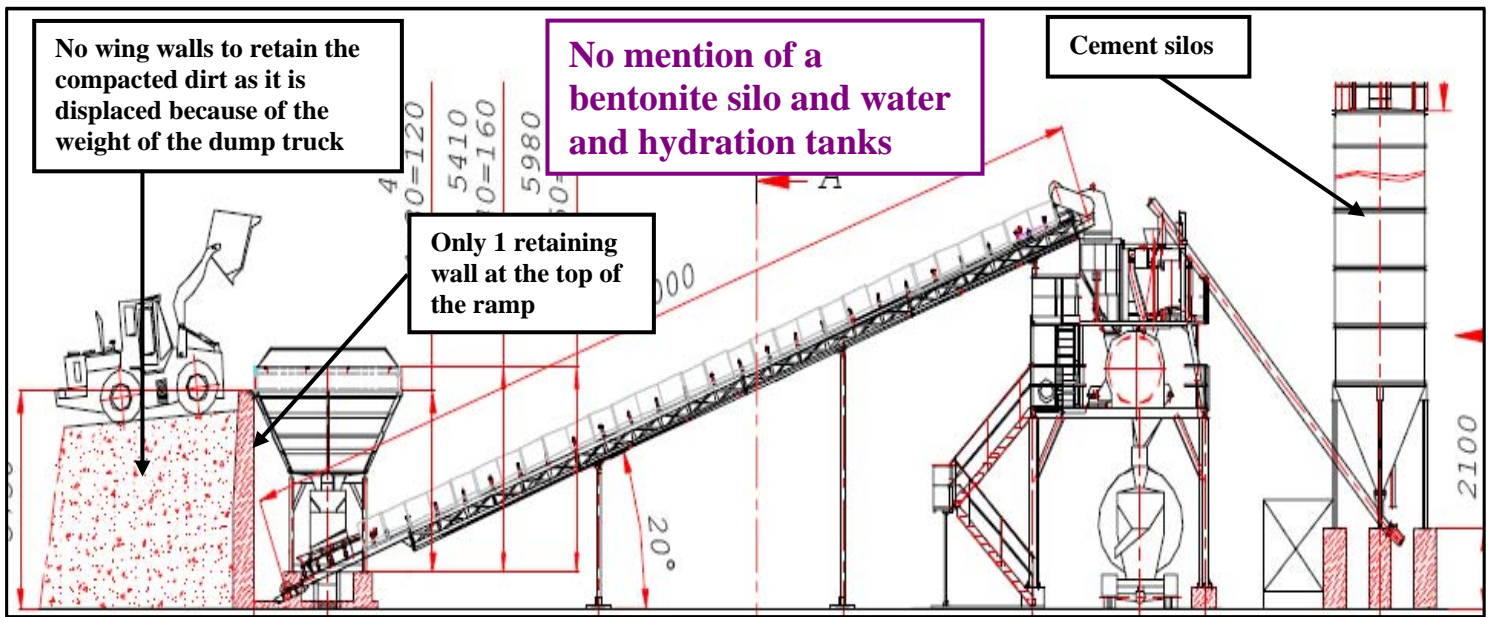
Contractor's design drawing for 100-m³/hour concrete-mixing plant
